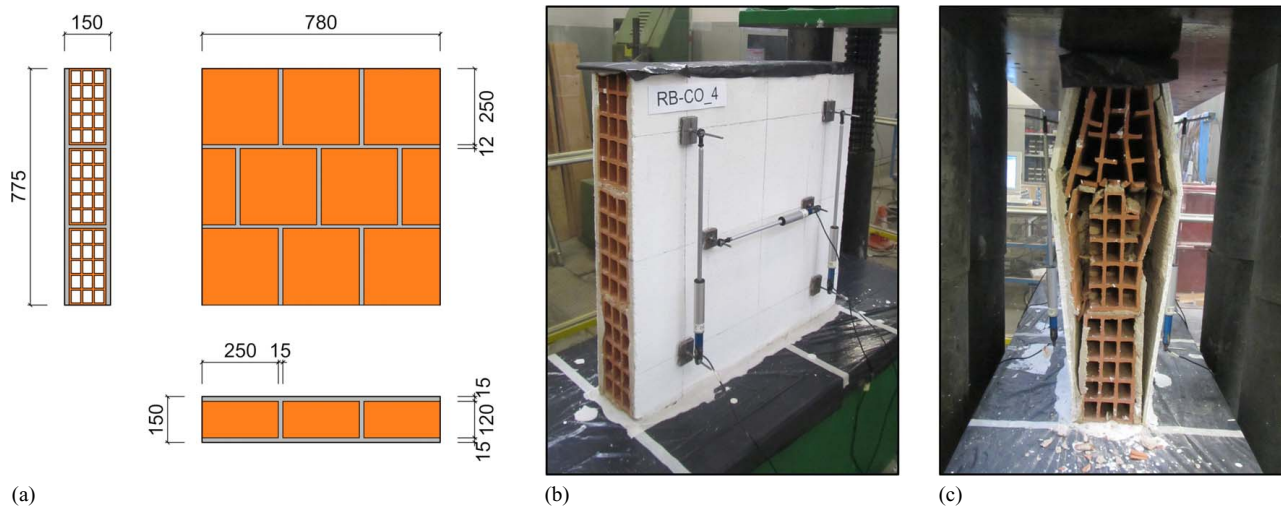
Compression tests: (a) geometry with dimensions in mm; (b) test setup; and (c) failure mode.
